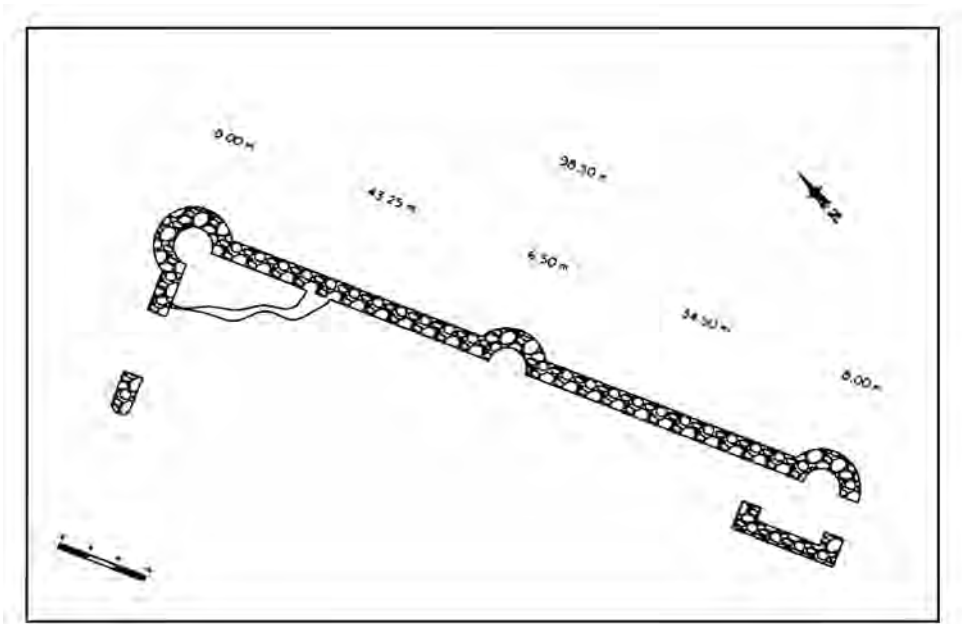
Plan of Qaleh Seden in the north of the Rumishkan Plain.
